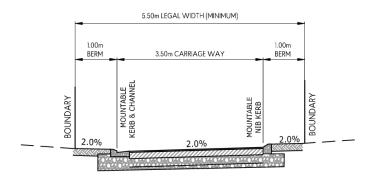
Typical JOAL Cross-Section (3) - 5.5m Minimum
